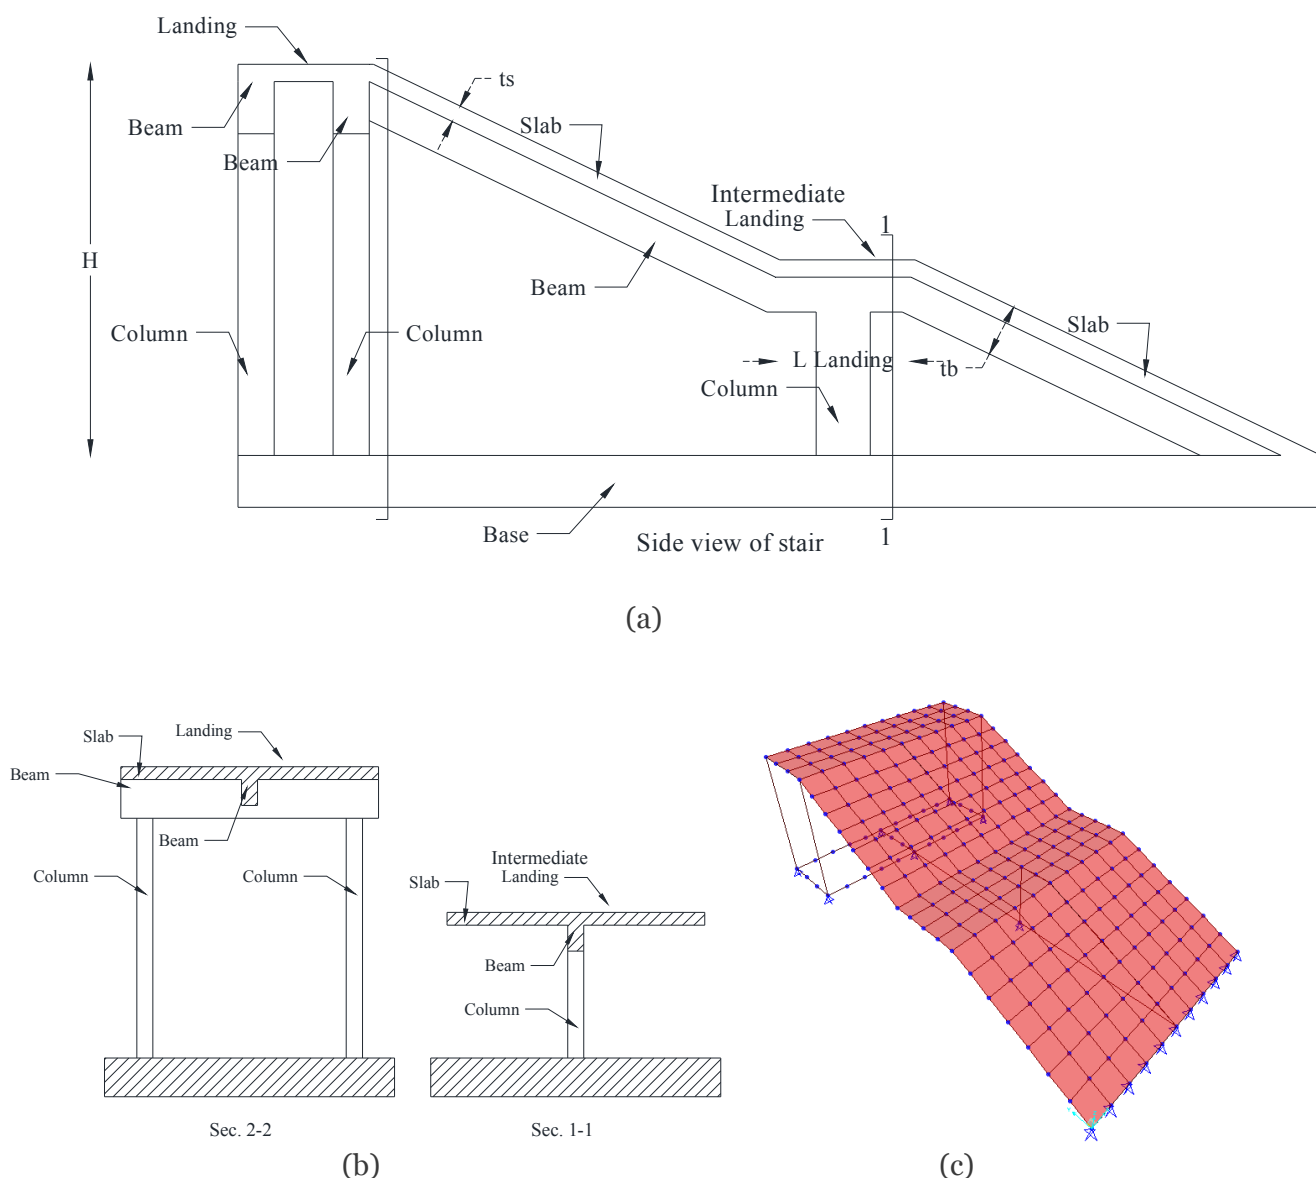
Details of Staircase: (A) Side View of Stair, (B) Sections of Stair (C) the Model
